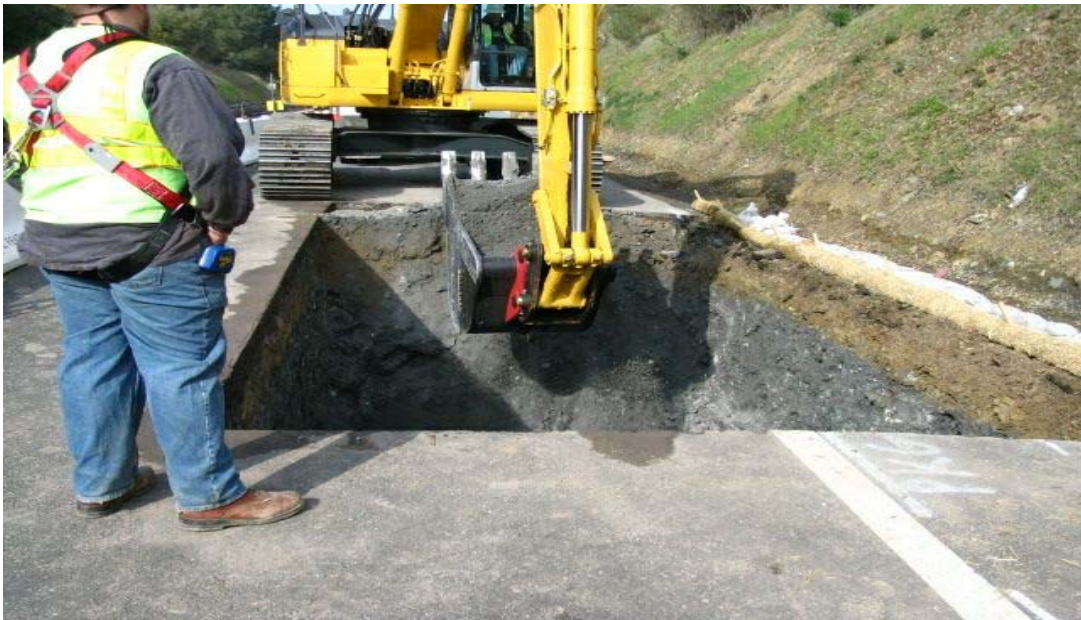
Excavating Manhole #9 vault pit (station # 139+00) along Cañada Road on Segment 1, January 24, 2005.
